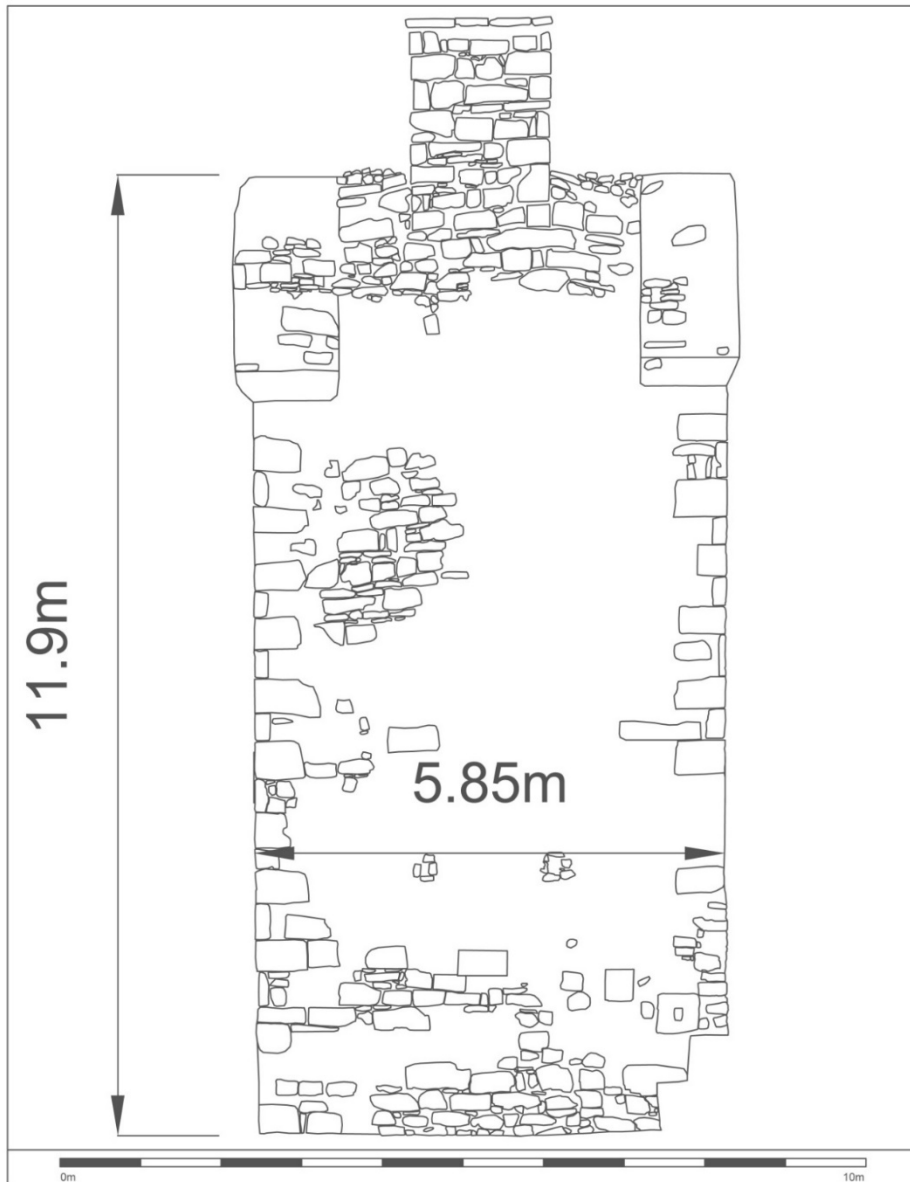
External elevation of the south wall of the signal tower at Rathlee Signal Station.
